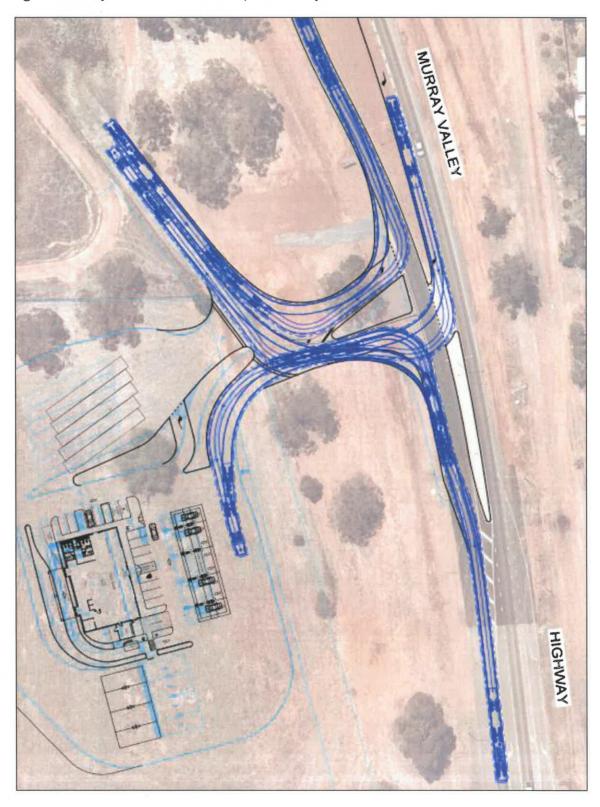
Intersection Concept Plan - Turn lanes into the proposed development (Sheet 2 of 2).
